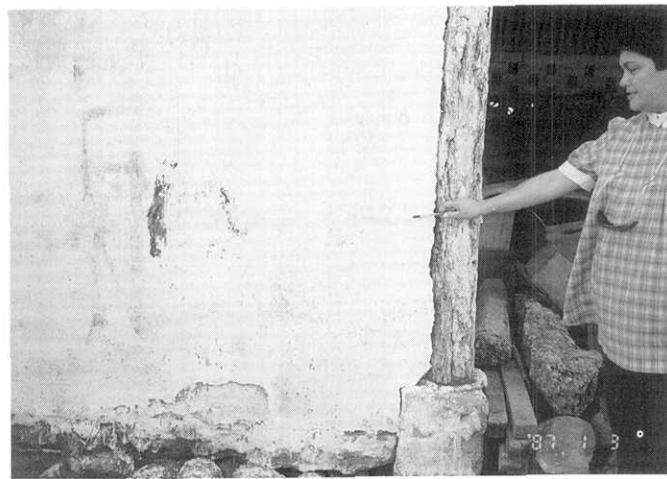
Trace of submergence on wall of a house beside the road at Poneloya. Sea water rose up to the level of the pen (B in Fig. 16).
